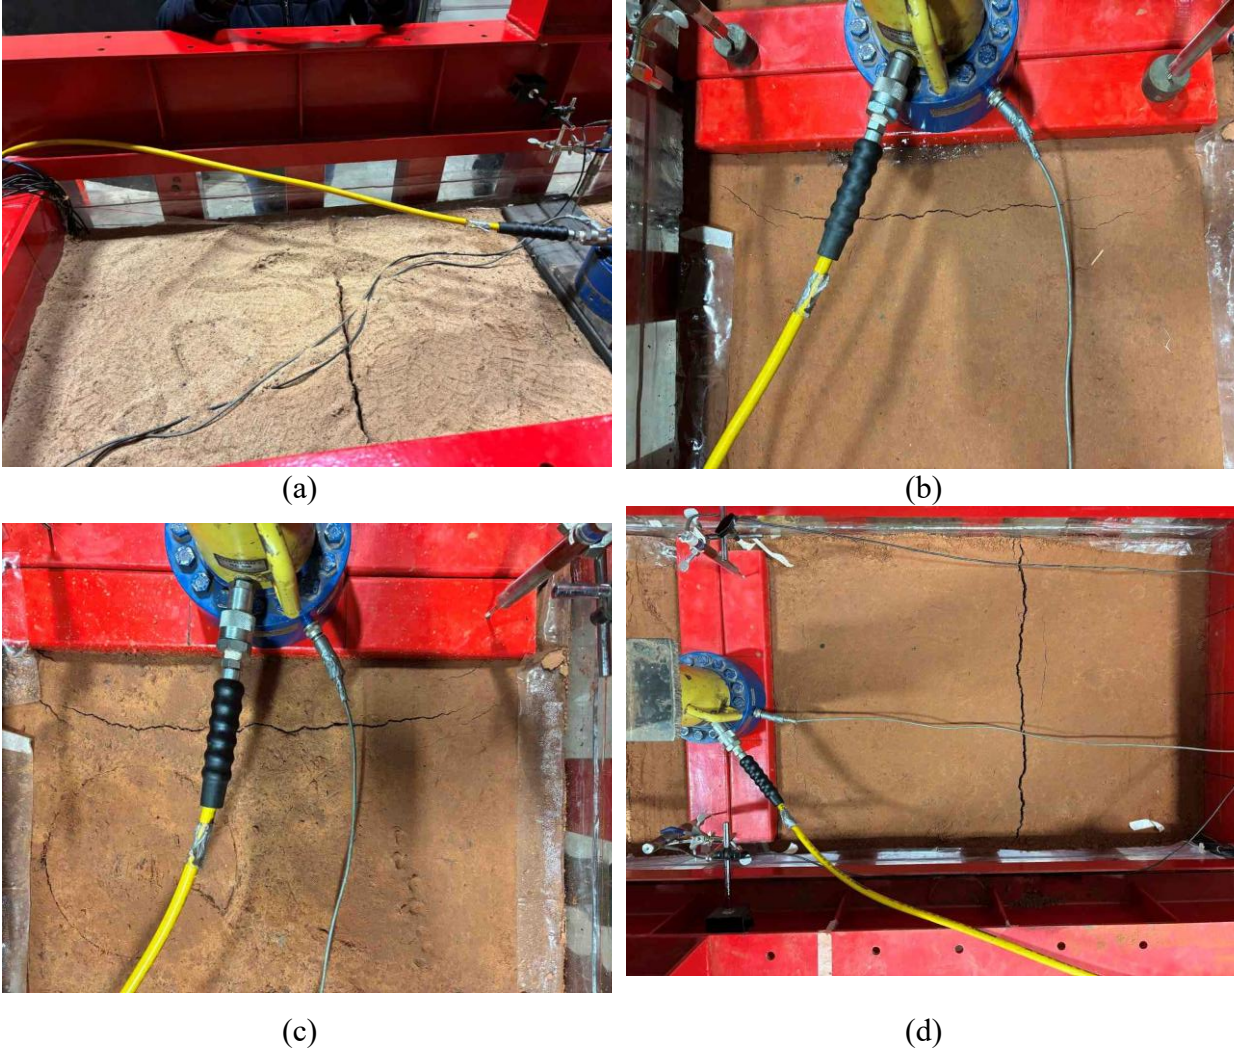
Structural damage observed in the model abutments at the point of test termination: (a) First model constructed with sand backfill, (b) second model with marginal soil backfill at 14% water content, (c) second model with marginal soil backfill under wet condition, and (d) third model with marginal soil backfill subjected to loading near the facing
